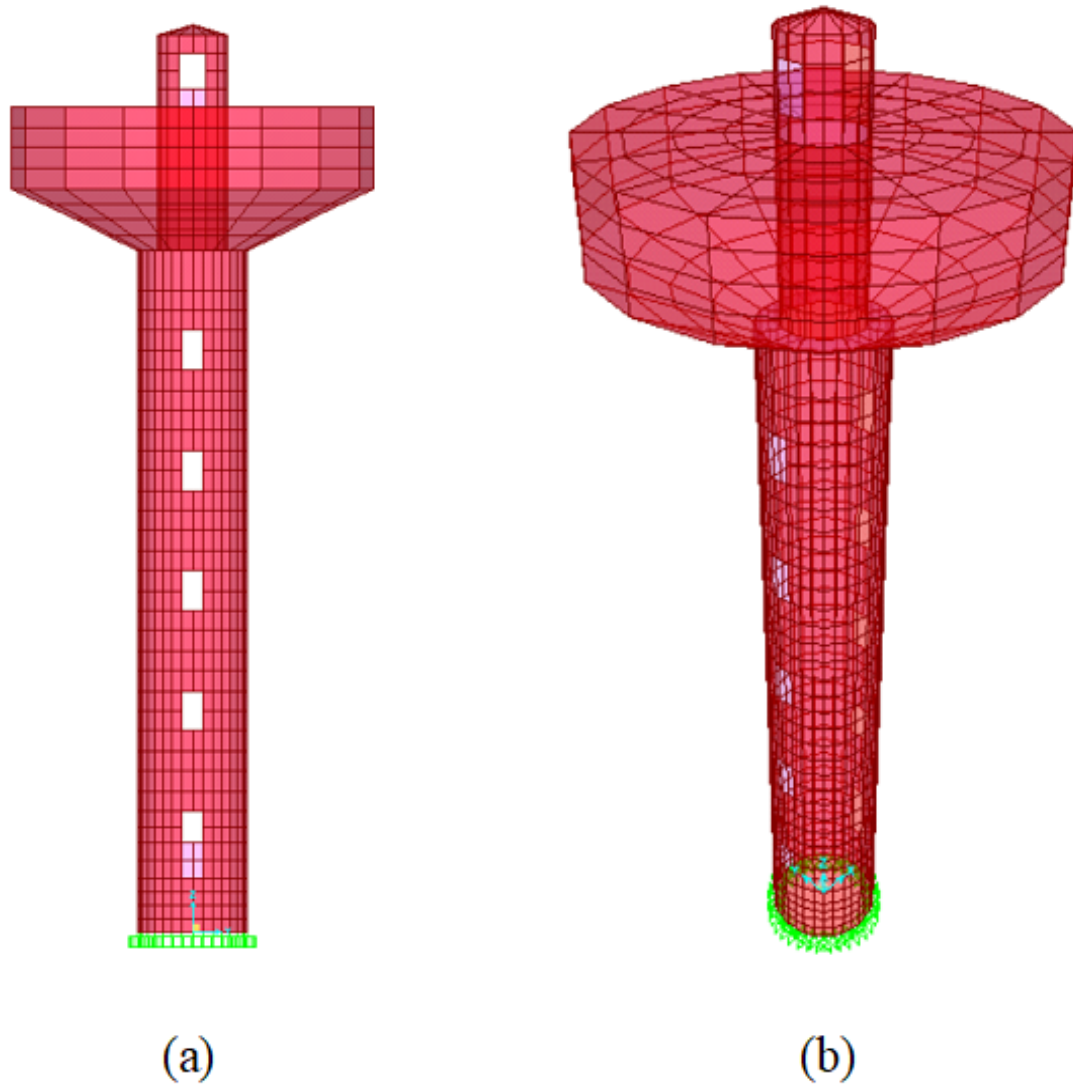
Modelling of Mashroom Type Elevated Water Tank in SAP2000;
